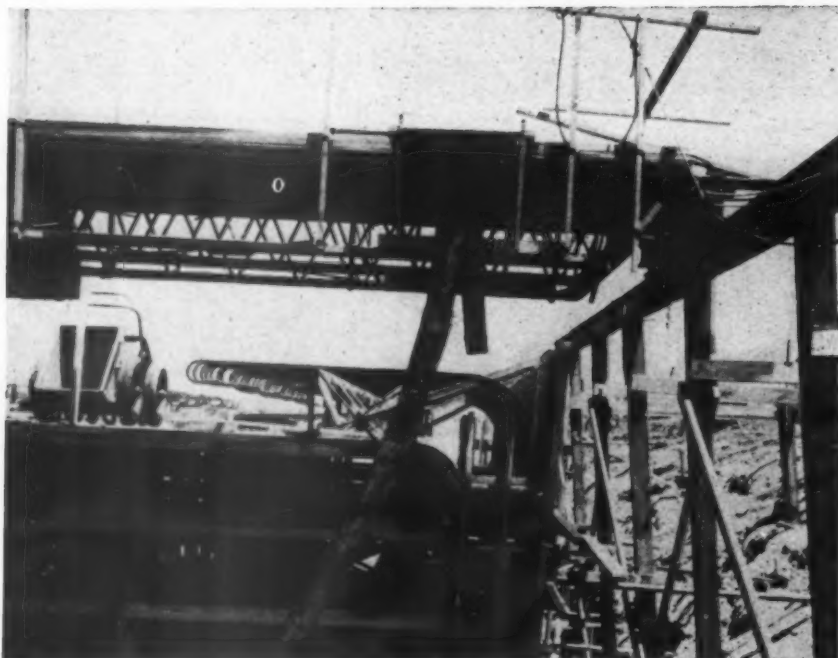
Pouring-truss with supporting track and trestle shown in detail. The formwork of the underpass barrel shows the batter on the walls used in the rigid frame design as well as the heavy corner reinforcing steel. Note neatness of contractors formwork and designed trestle
